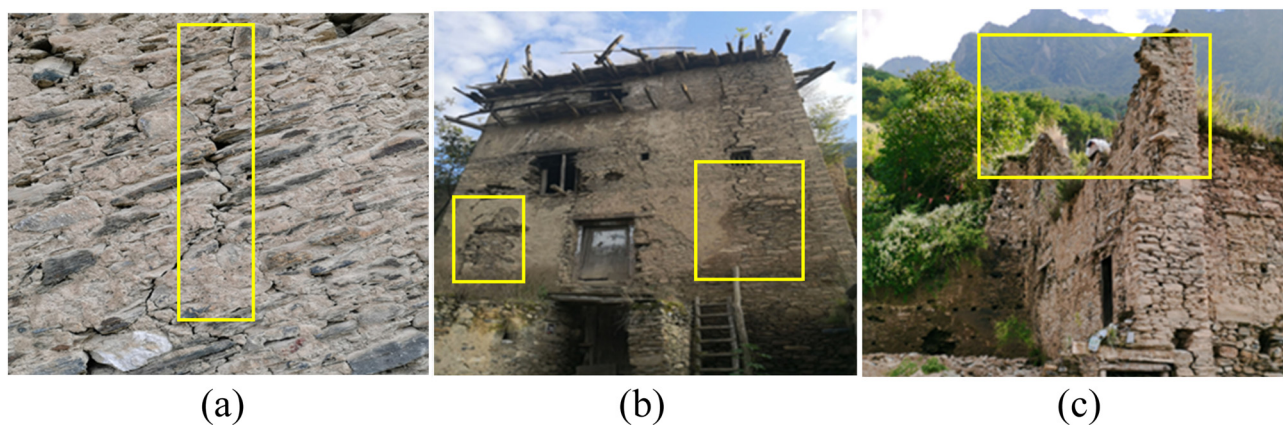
Disease status of Qiang Village wall: (a) wall cracks, (b) wall surface soil falling off, and (c) wall collapse.
